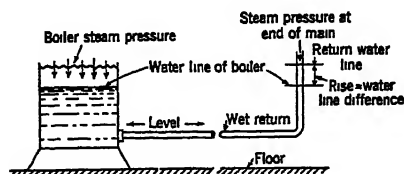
DIFFERENCE IN STEAM PRESSURE ON WATER IN BOILER AND AT END OF STEAM MAIN
